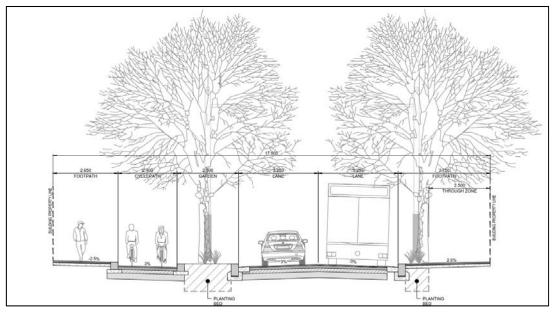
Typical cross section for the western section of the proposed Connector Road
